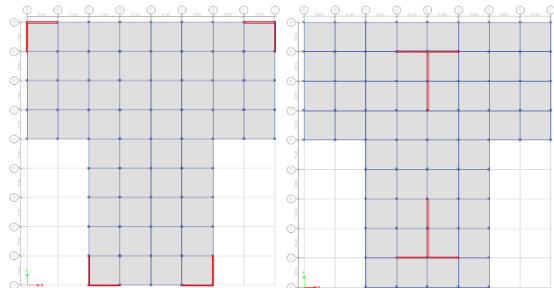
Shear wall at location 1 Fig- 2 Shear wall at location 2
